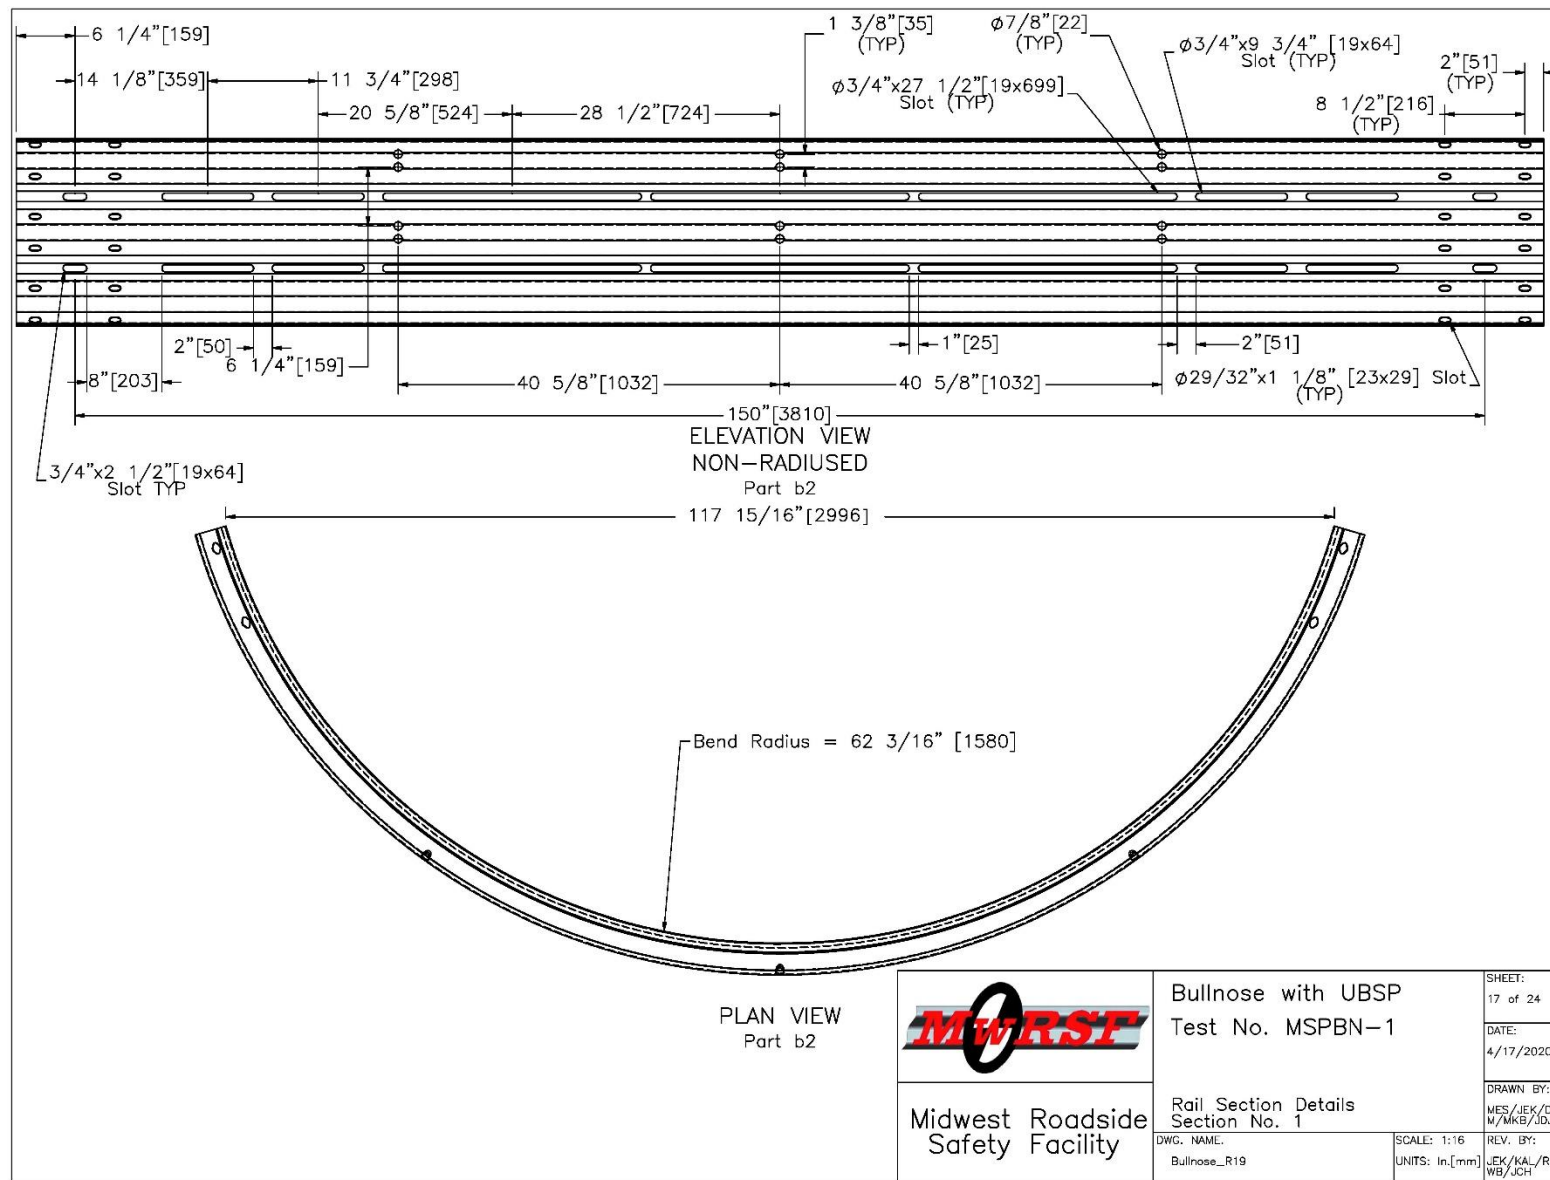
Rail Section Details Section No. 1, Test Nos. MSPBN-1 through MSPBN-3
